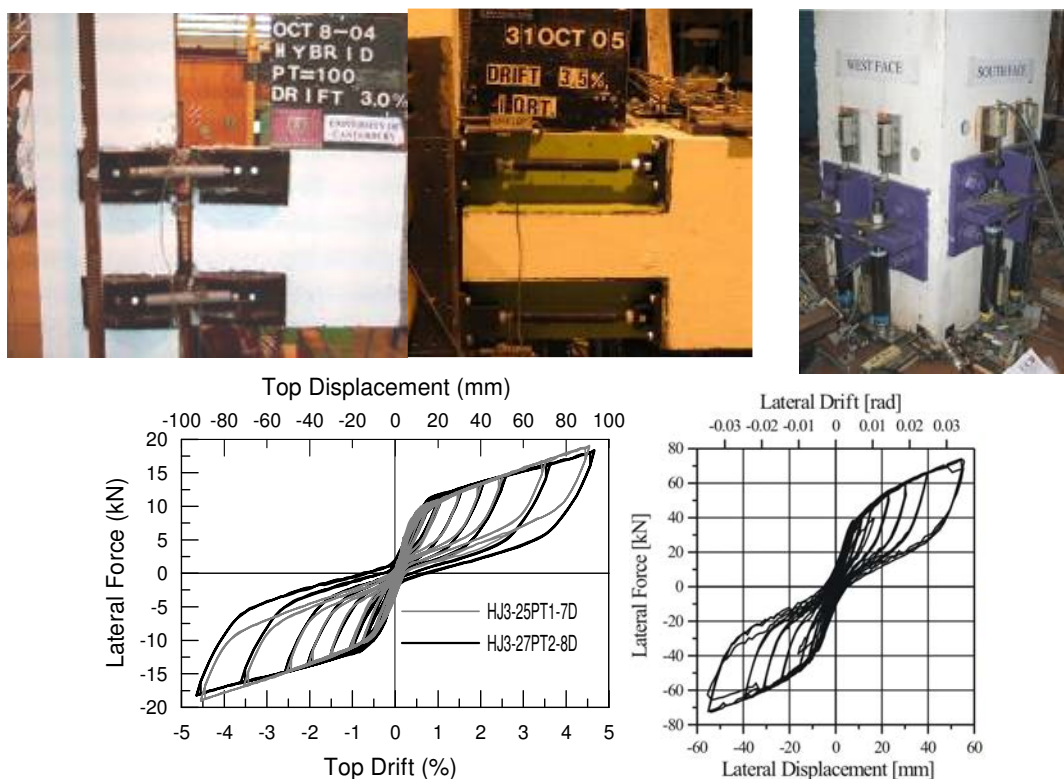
Alternative configurations of external replaceable (PnP) dissipaters for hybrid systems: Top left and centre: beam-column connections, with and without recess in the beam (from Pampanin et al. 2006); Top right: Column to foundation connections (from Marriott et al., 2009) Bottom: typical flag-shape hysteresis loops for a hybrid beam-column joint and a column-to-foundation connection with external dissipaters.
